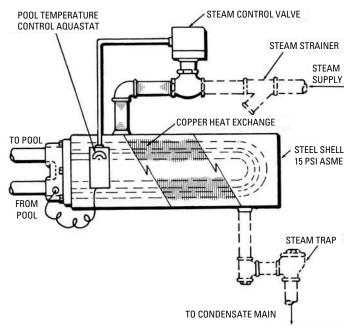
Heat-exchanger pool heater using steam as a heat source. (*Courtesy Bryan Steam Corp.*)
